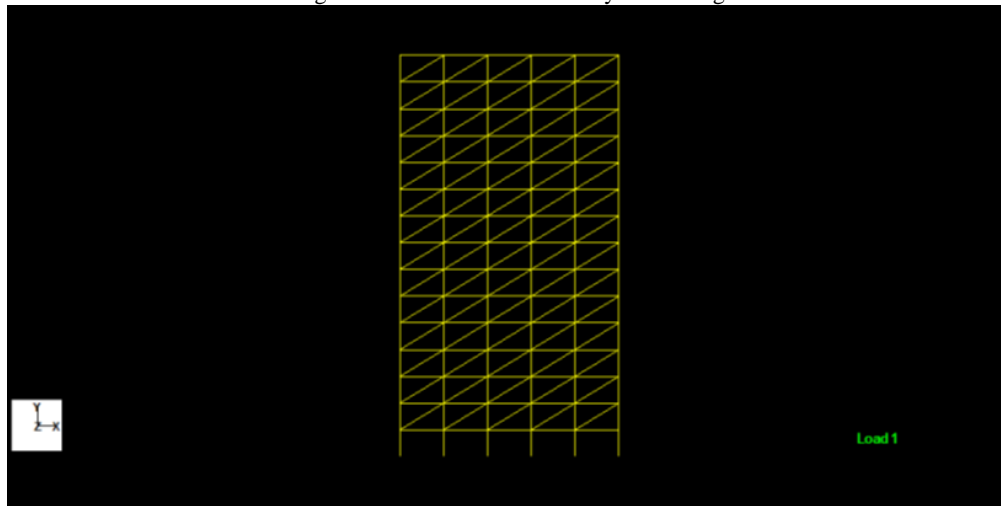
Elevation of Multi-Storeyed Building with Diagonal Bracings
